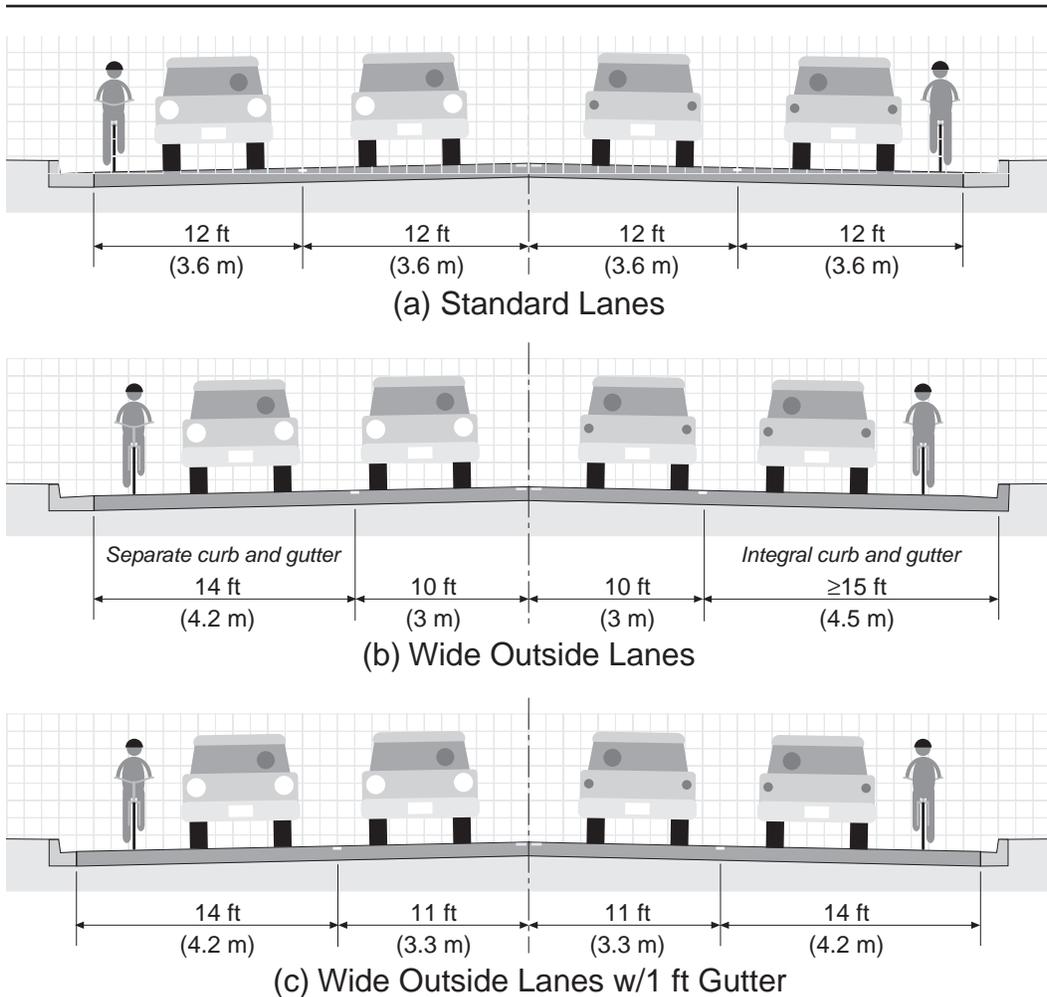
Shifting lane striping is one way to create a wider outside lane. With a concrete street with integral curb and gutter, there is no joint line that can possibly endanger bicyclists. If the curb and gutter are being replaced, extra space may be gained by reducing the gutter pan width to 1 ft.
